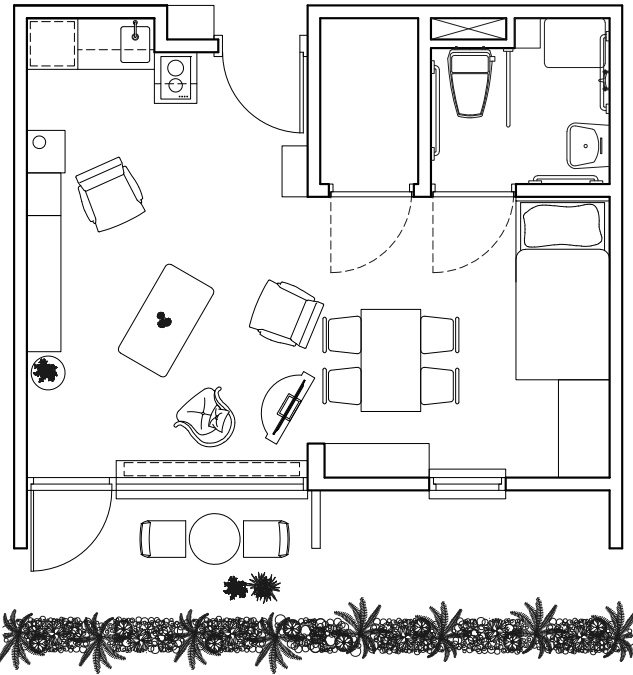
Floor plan of the room #03 (illustrated by author)
